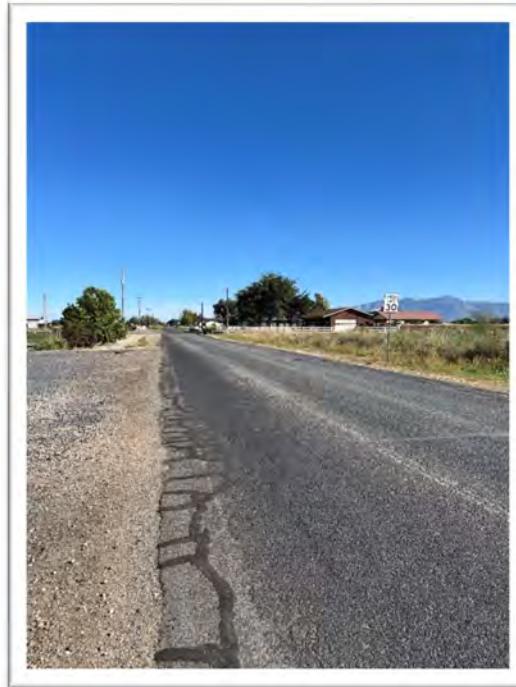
Fatigue Crack Sealing on Road Edge
